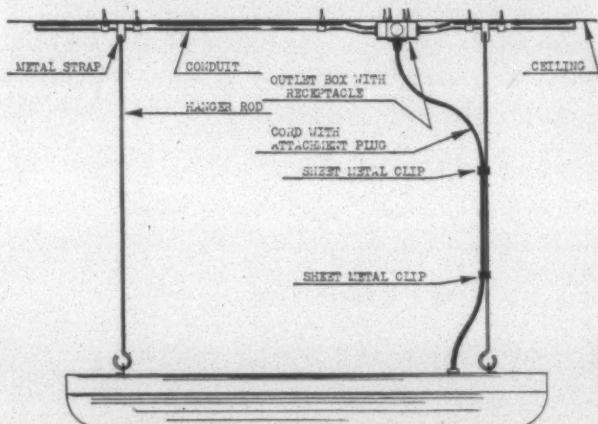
Application of sheet metal clips to the hanger rods so as to support weight of the lamp cord with the attachment plug cap (taking weight off the receptacle in the outlet box at the ceiling). This shows application of hanger rod as a method of hanging fixtures from the conduit overhead.
